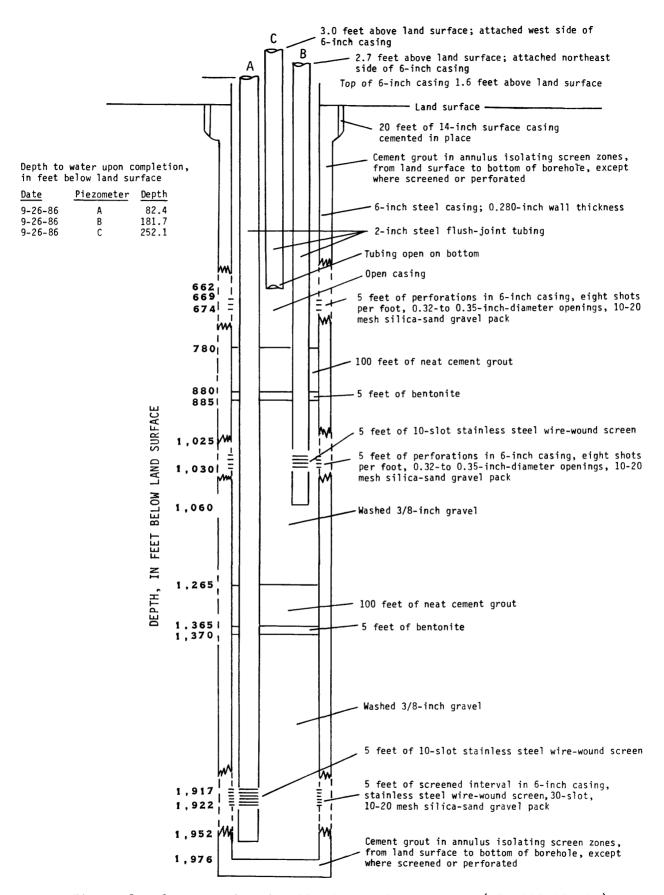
Construction details for well nest SF-1 (17N.09E.35.131).
